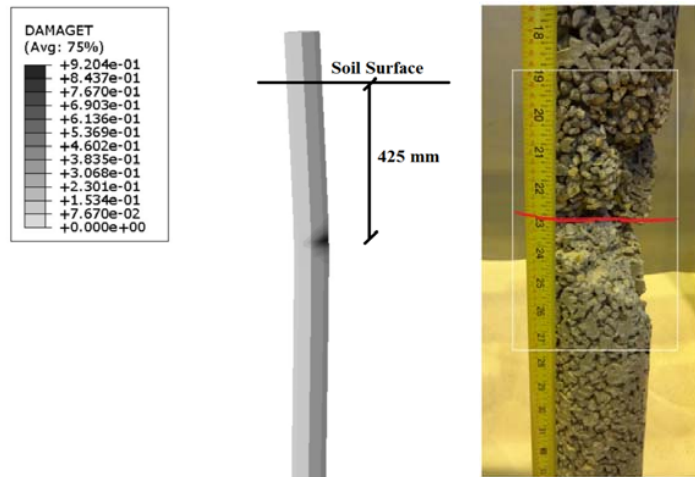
The comparison between estimated (425 mm) and experimented (470 mm) depth of crack of small-scale pervious concrete pile in horizontal loading [10]
